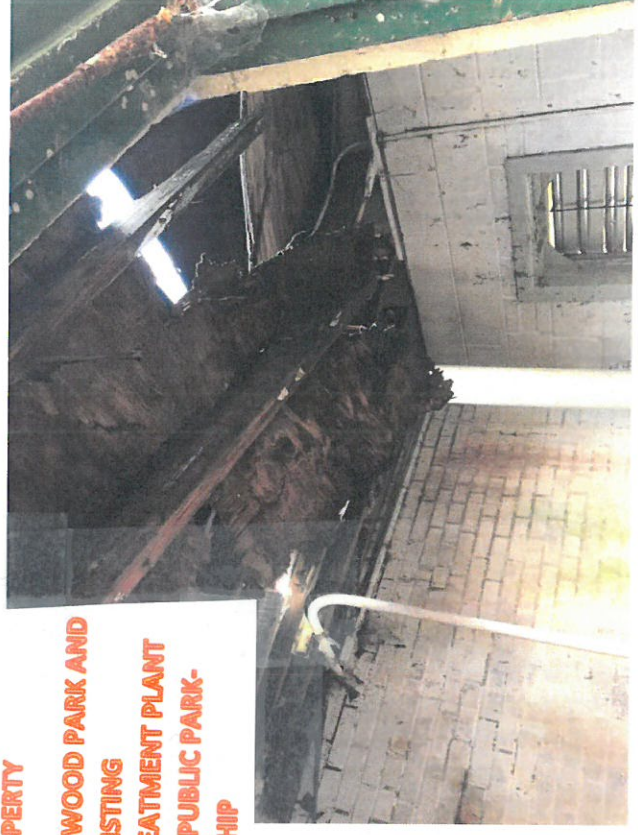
A view of the wood roof of the south room of the Pump Building.
